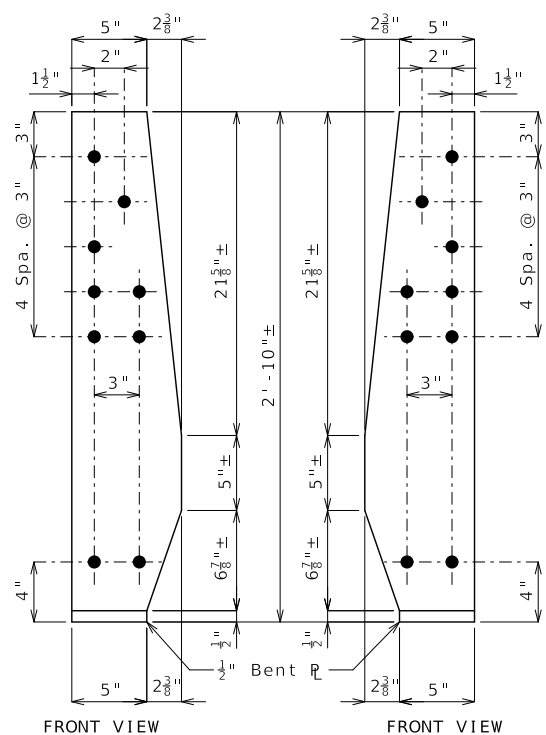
DETAILS OF ALTERNATE SADDLE BEARING STIFFENER REPAIR
